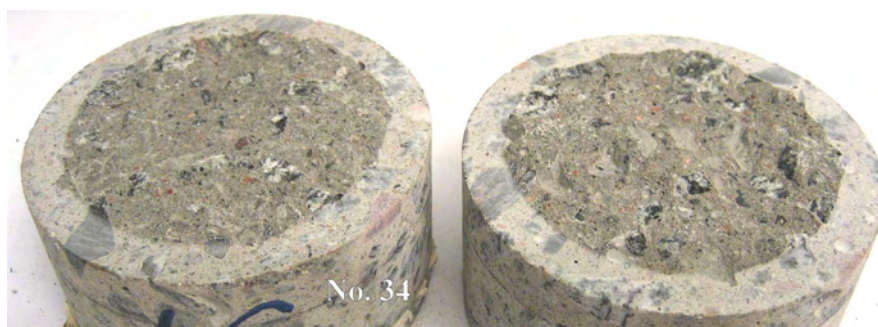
Photograph showing the failure surface for test No. 34 after fatigue test.
